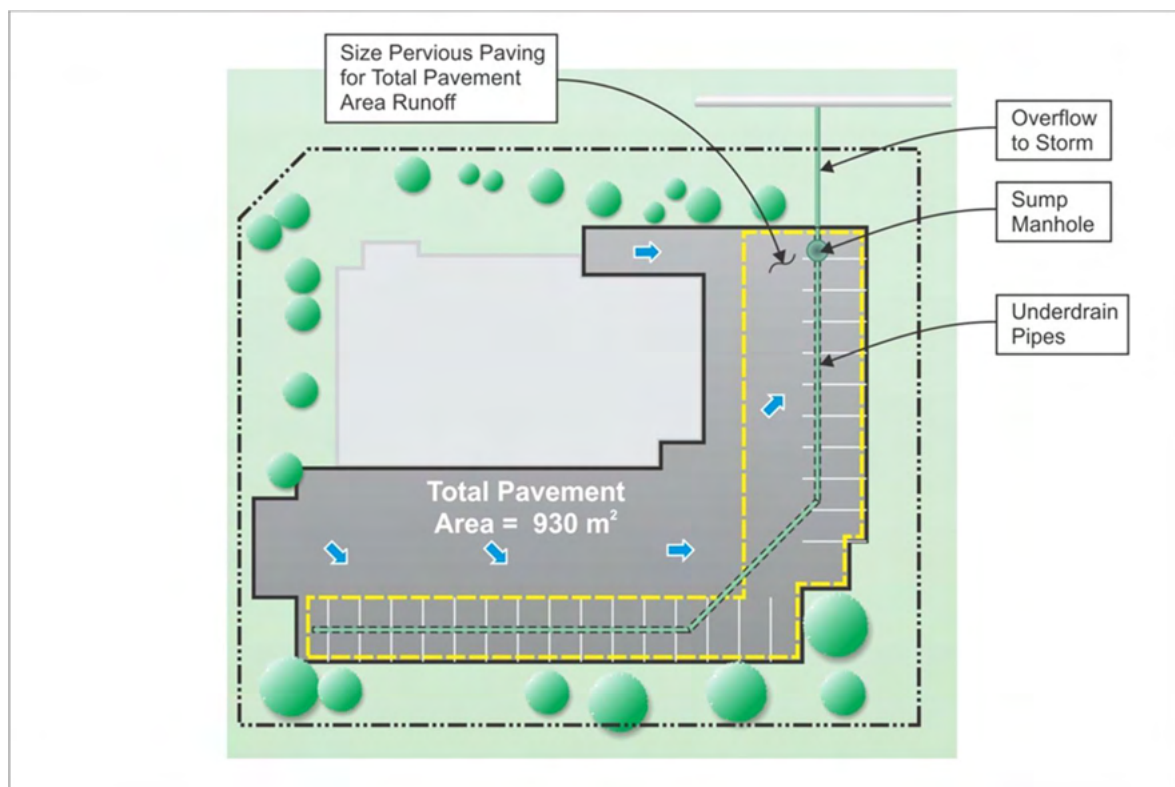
Example – Parking Area Draining to Pervious Paving
